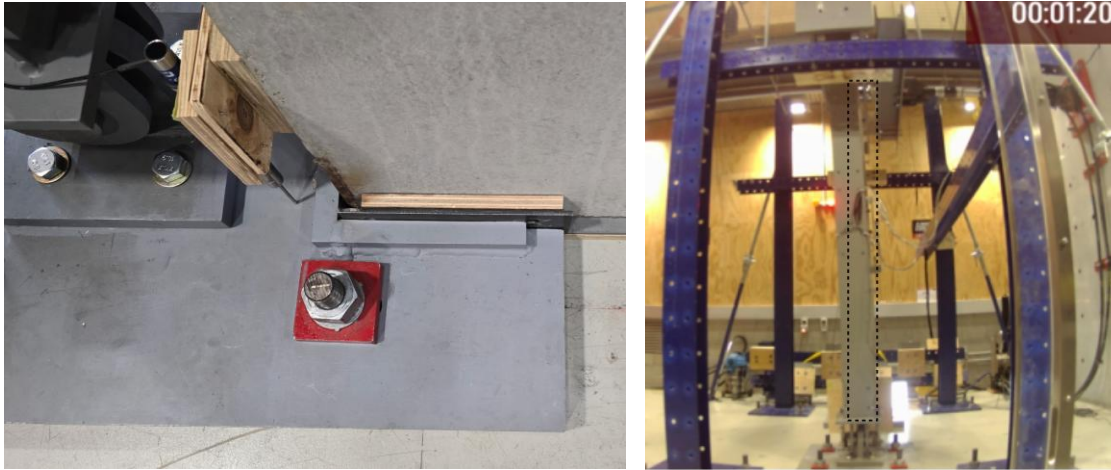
Wall corner shoe brackets in contact with the base plate to transfer shear (left); Inclined wall position (Right)
